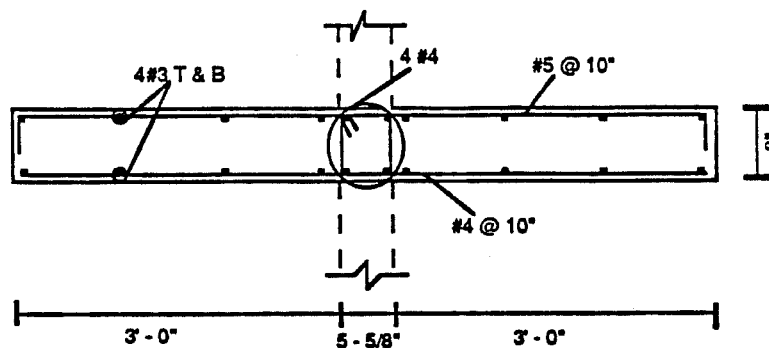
Specimen 2a Slab Reinforcement Detail
